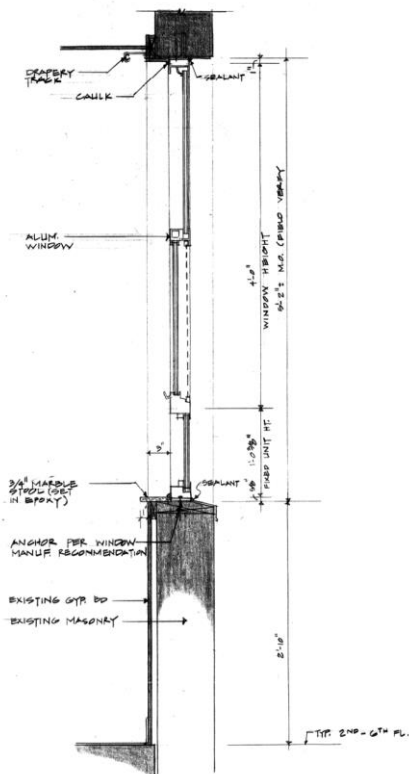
Section through typical window 2<sup>nd</sup> through 6<sup>th</sup> floor
